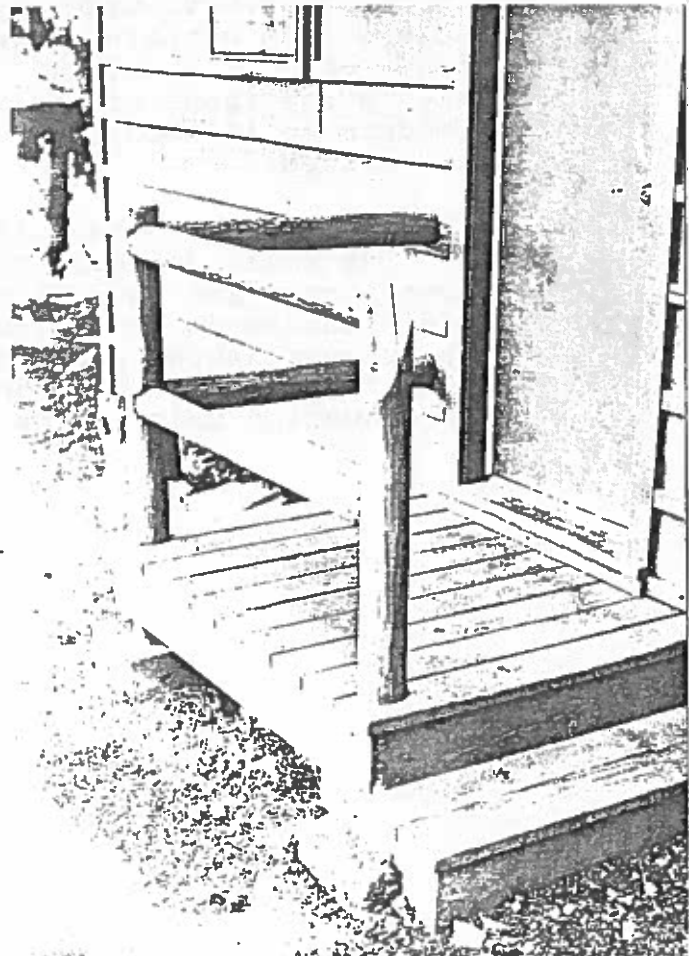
Looking at a typical handrail detail. This is a good model for all cabin stoops.
